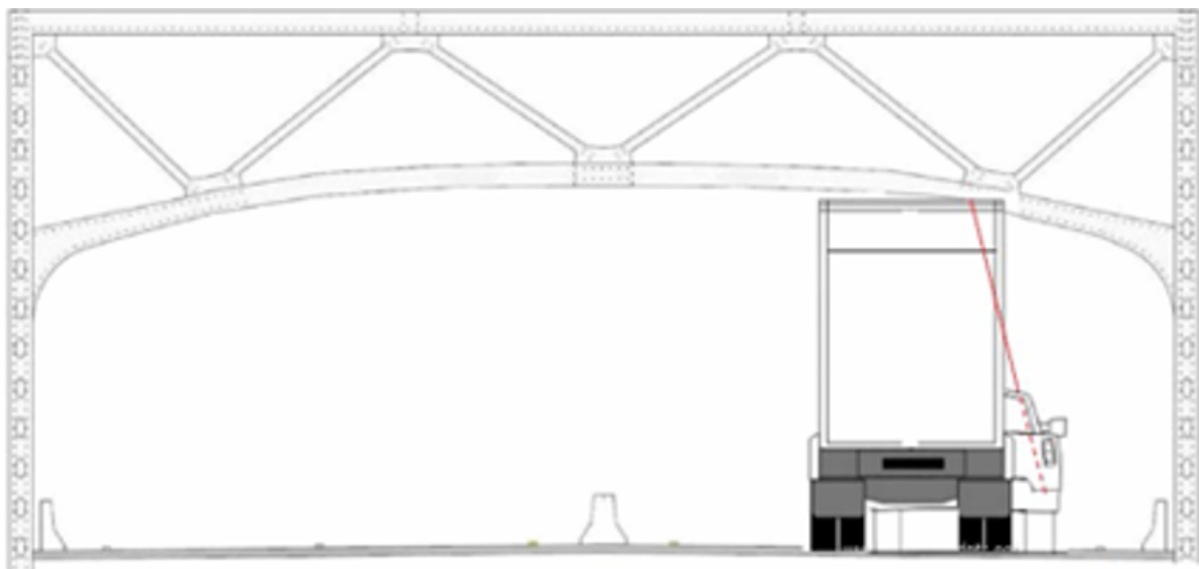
A cross-section of the bridge showing where the truck had impacted the bridge.
